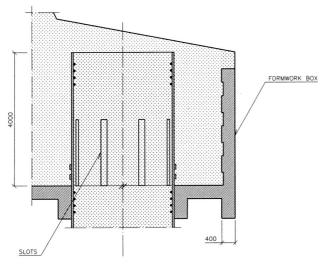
Detail of upper part of steel pile with pre-cast formwork box
